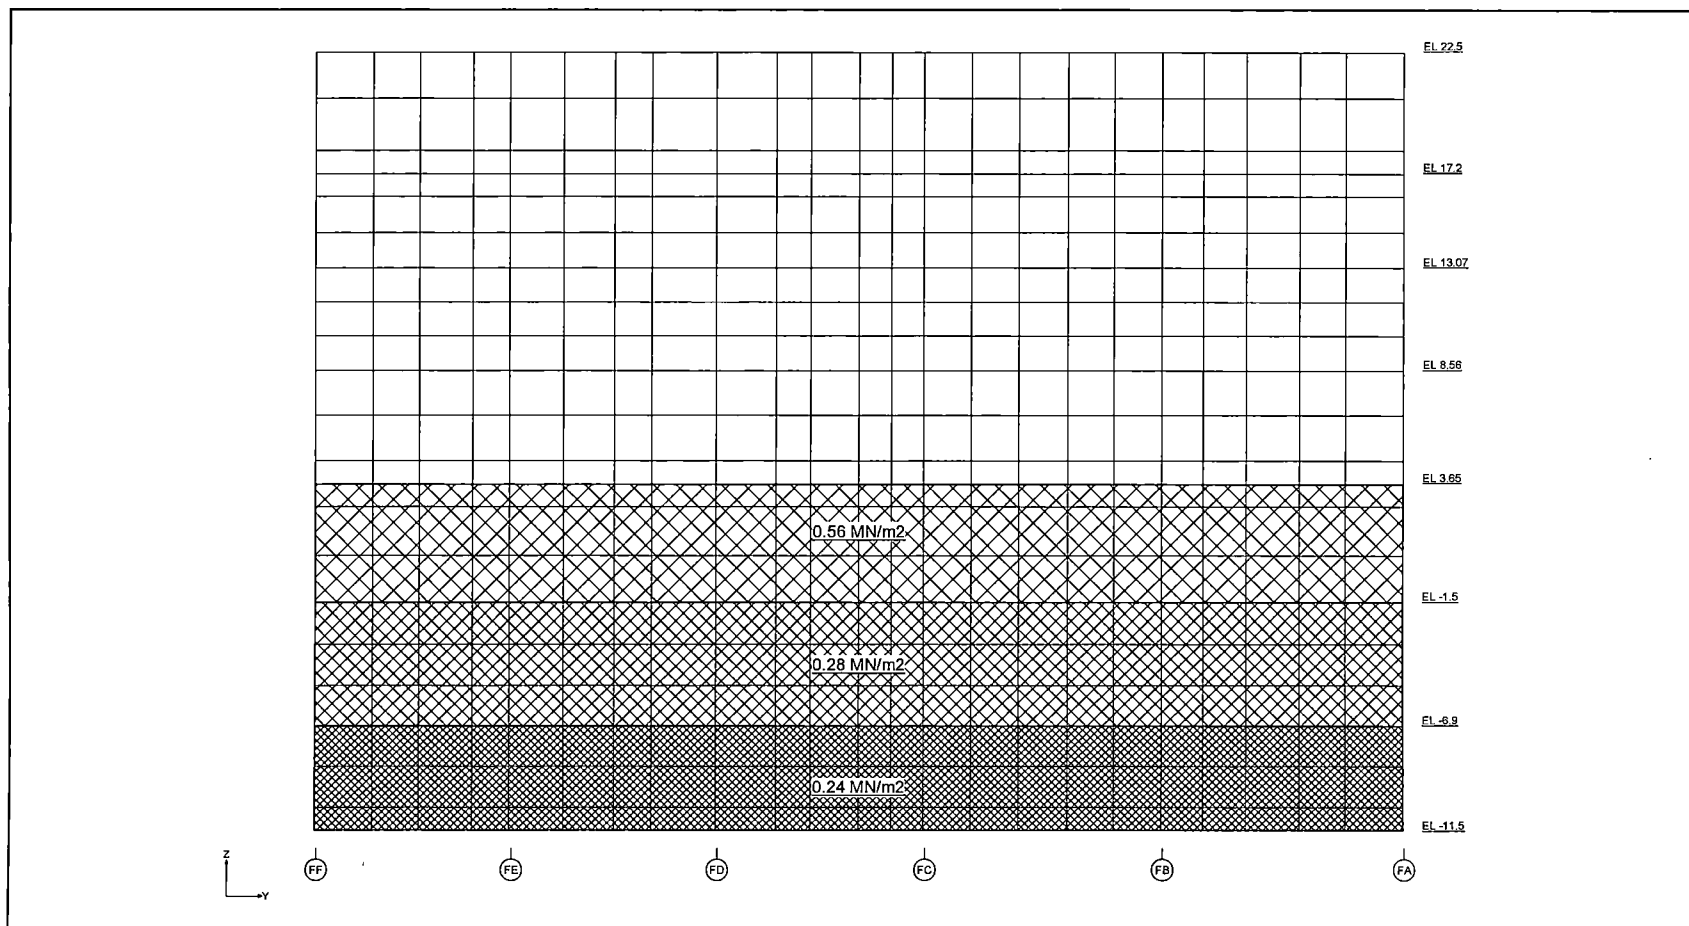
Soil Pressure Due to N-S Direction Earthquake on the External Wall (F3 Column Line)
